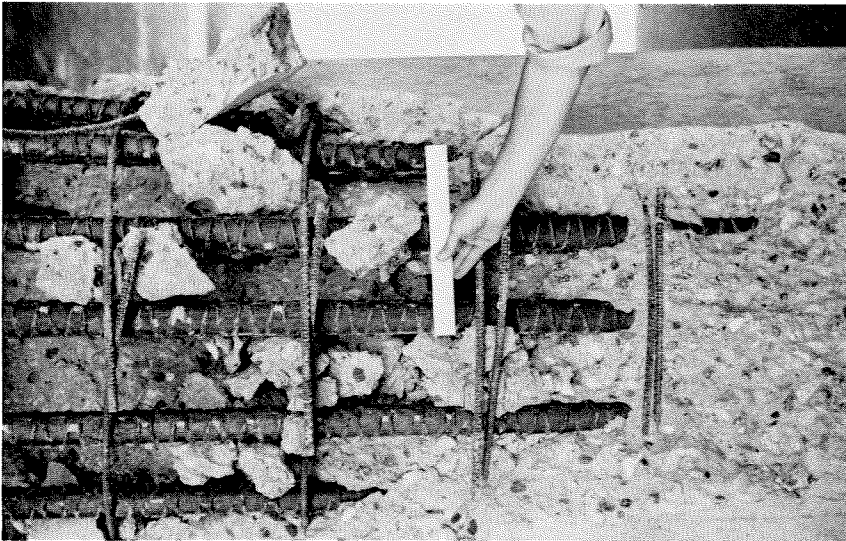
Details of column construction, Foothill Boulevard undercrossing, Foothill freeway.
